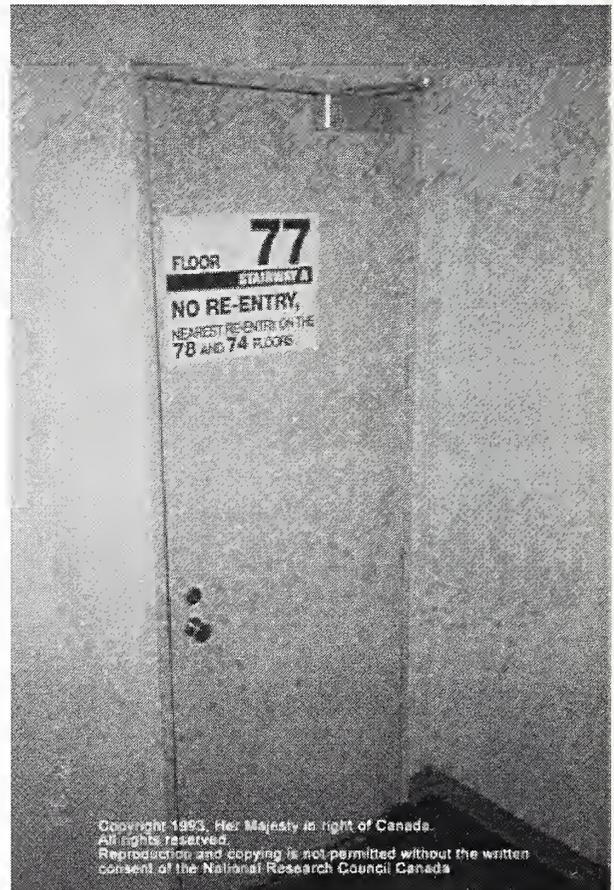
Stairwell door signage as seen from inside stairwell A.
